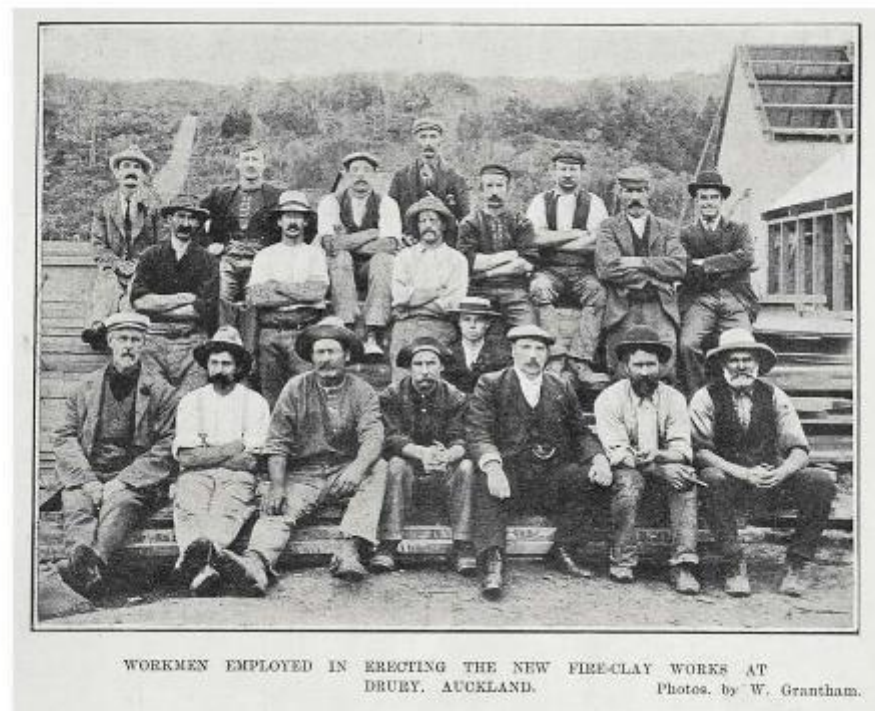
Photograph taken during construction of the new works, with the tramway route to the mine visible in the background.
